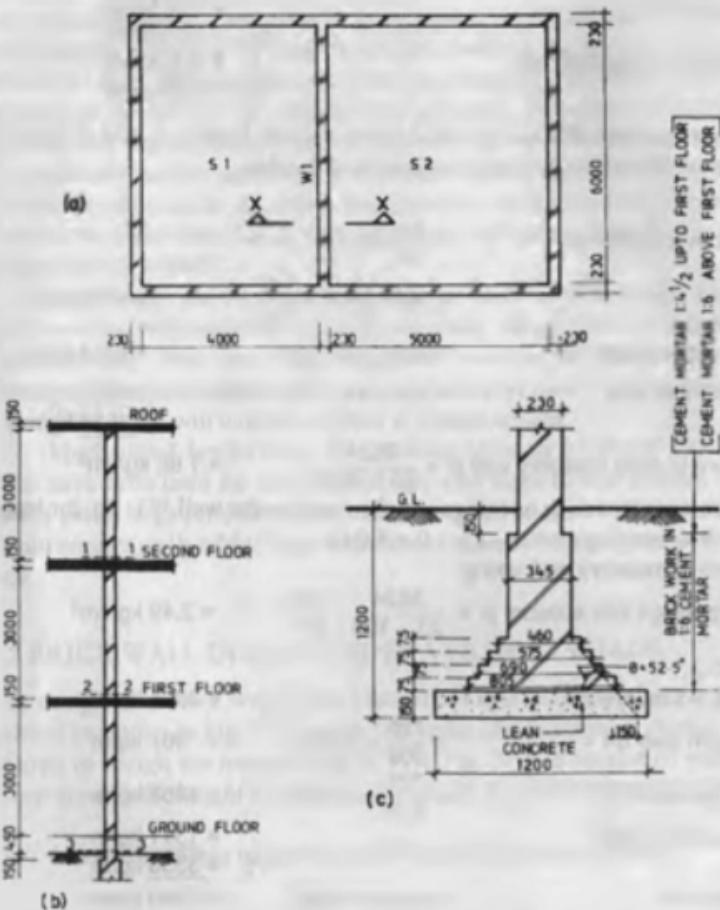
Load bearing brick wall under vertical load. (a) Part plan of building; (b) Section X-X. (c) Details of footing for brick wall W1.
